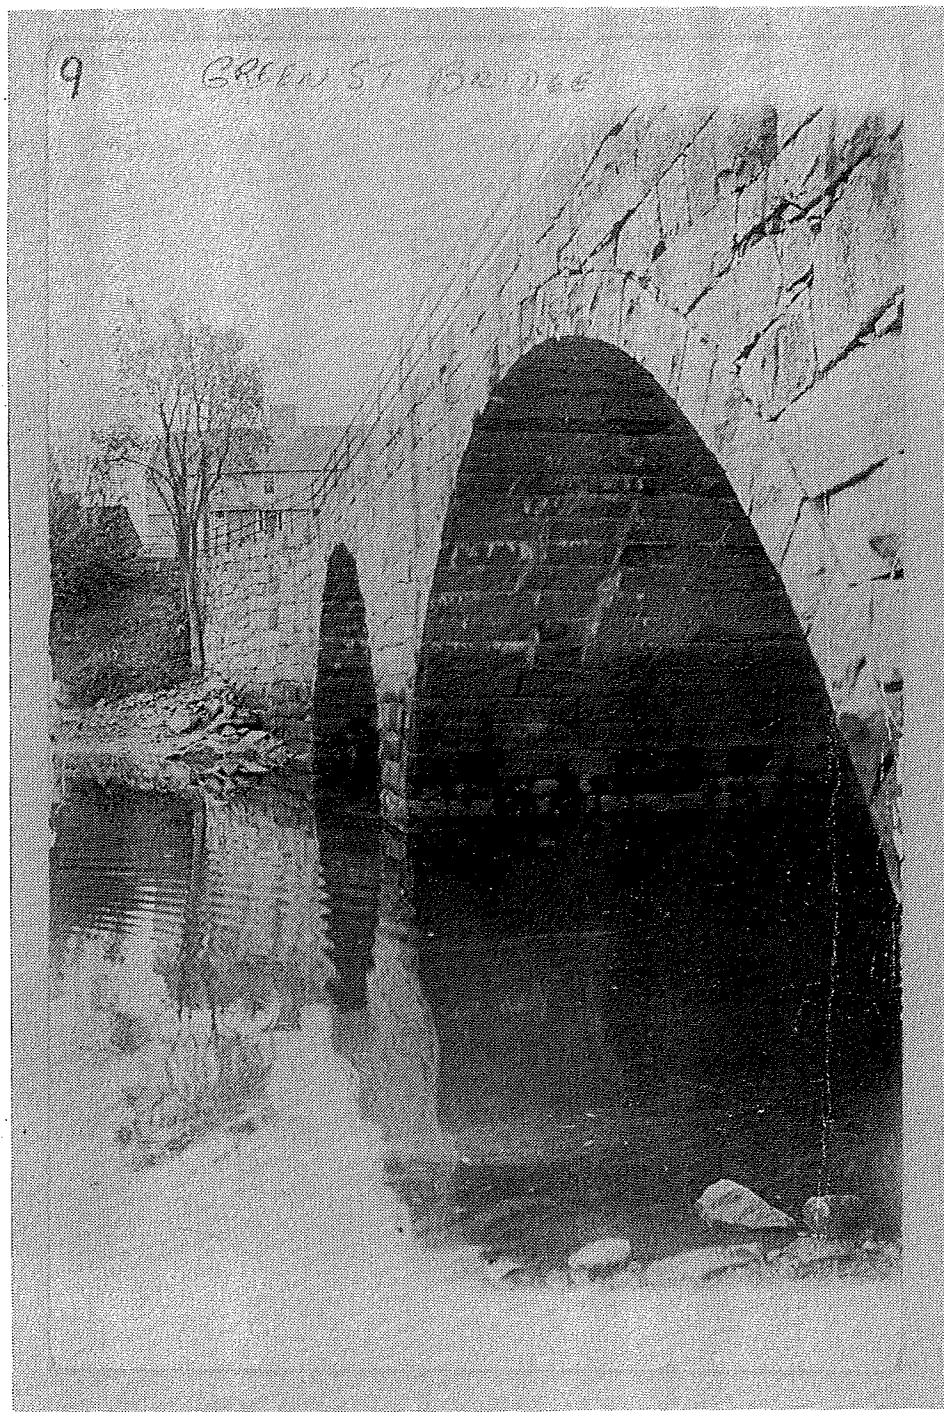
Green Street Bridge and Emerson House, Ipswich. Postcard ca.1910 showing northeast side original stonework. Courtesy of Susan Boice.
